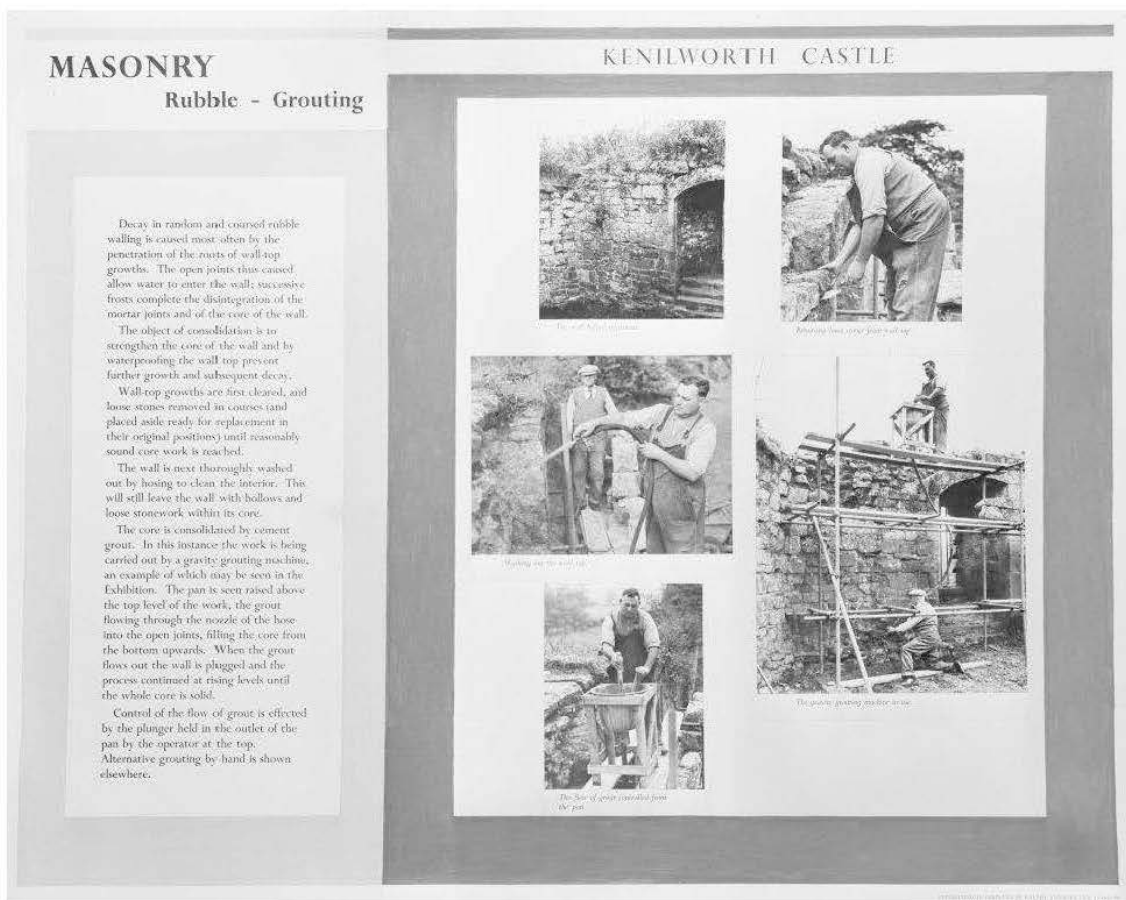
Exhibition panel: grouting of masonry at Kenilworth Castle. Reproduced by permission of English Heritage
